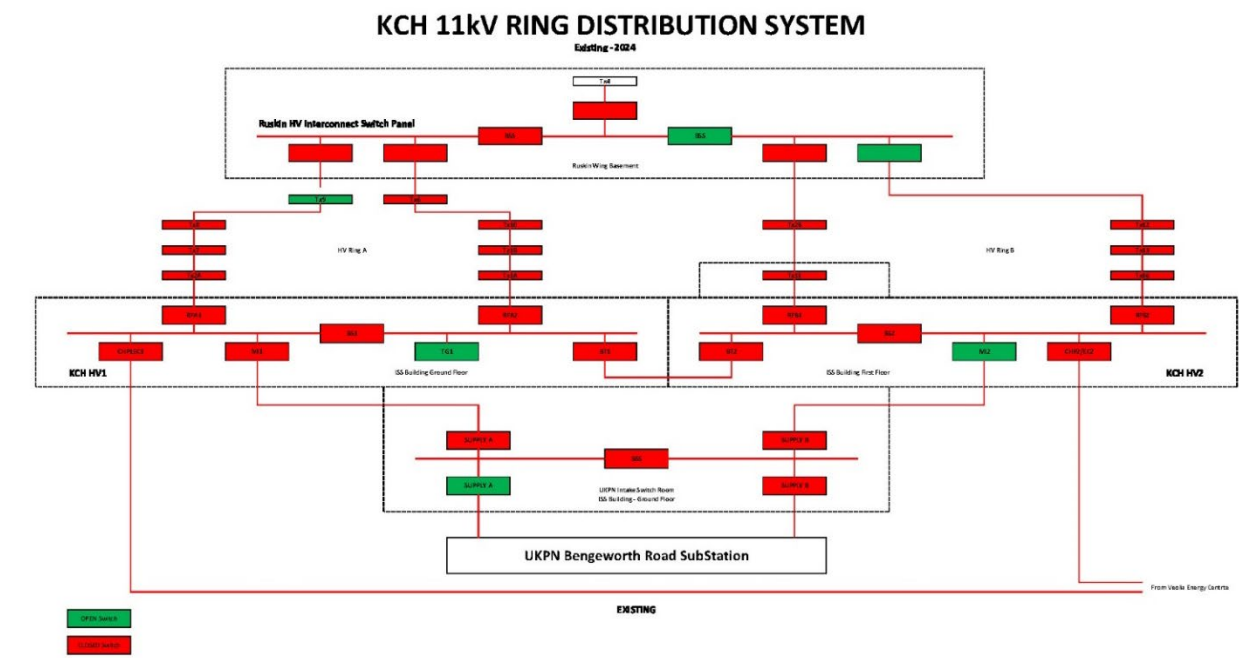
Simplified Existing MV Site Wide Electrical Distribution Arrangement
